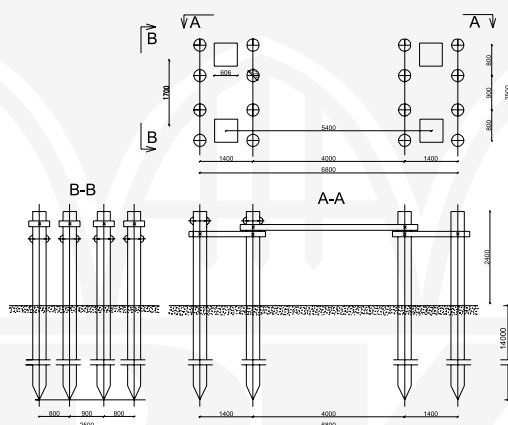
Configuration of the pile foundation of the bridge indirect supports
